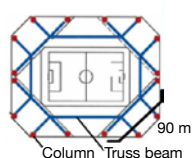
Parallel-cross Truss Arrangement and 3D Truss Structure
